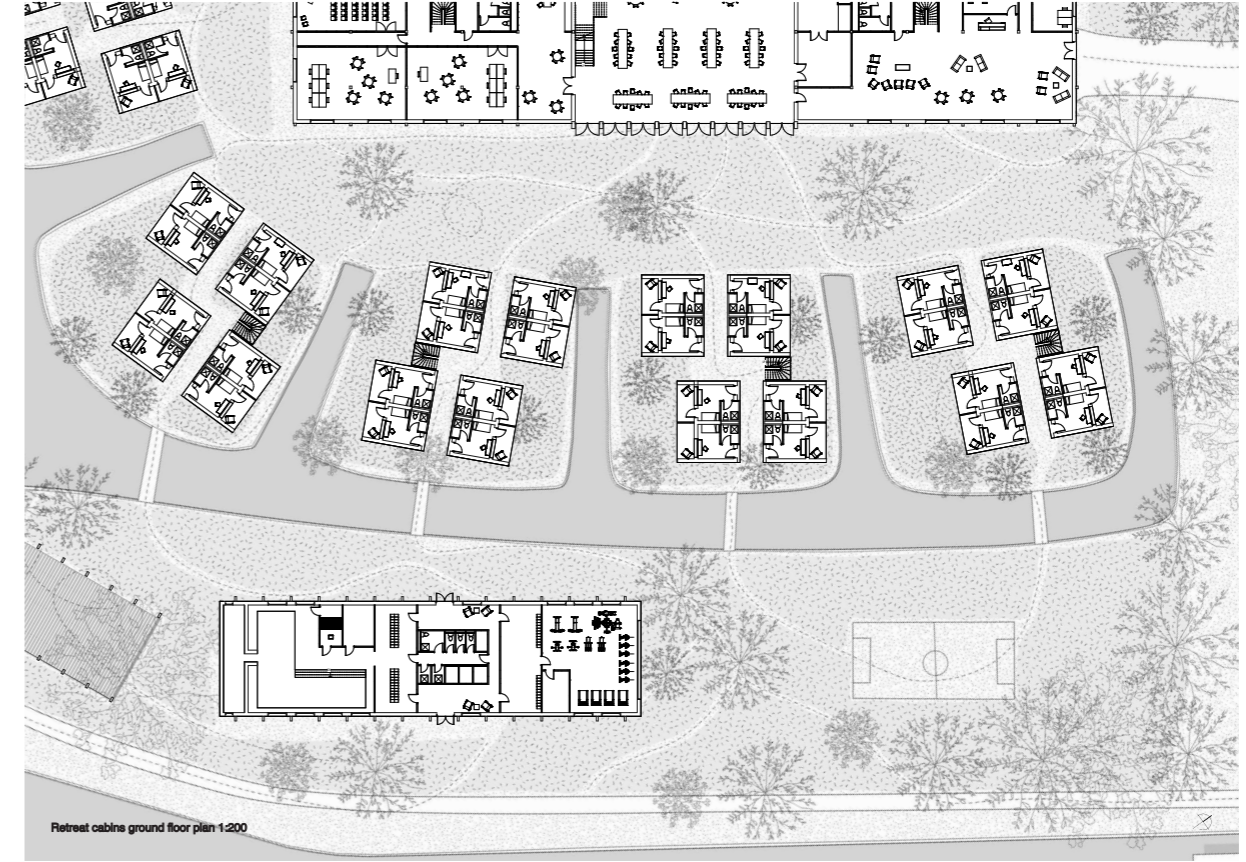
Private retreat cabins ground floor plan 1:200 rescaled. Source: Own work, 2026.
